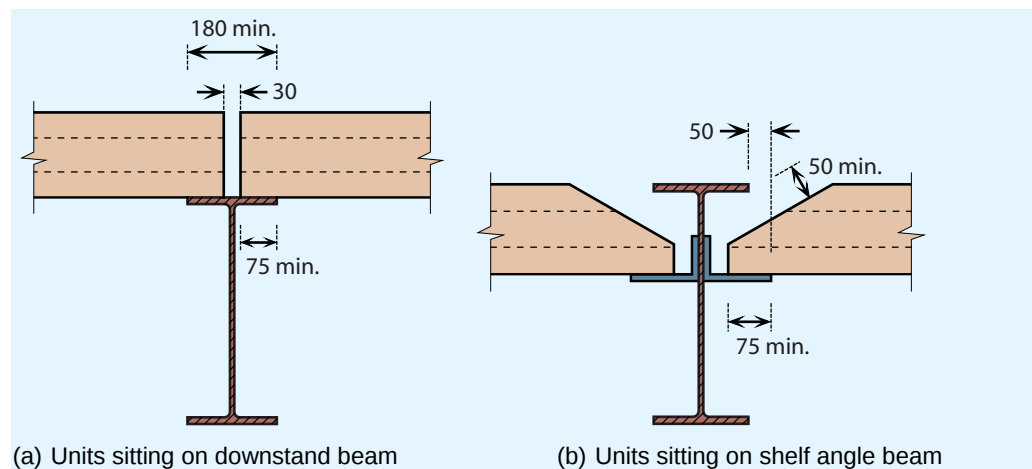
Floor construction with precast concrete units in non-composite construction
